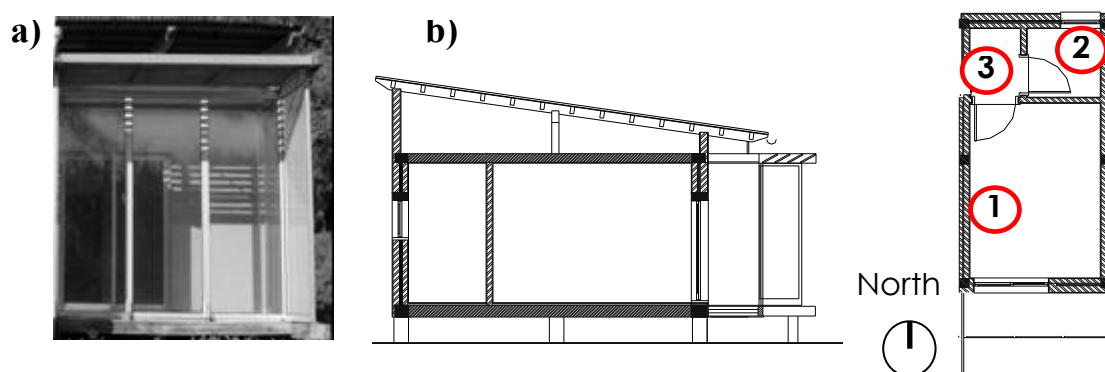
Conventional Test Cell: a) Photo; b) lateral view; c) plan view
